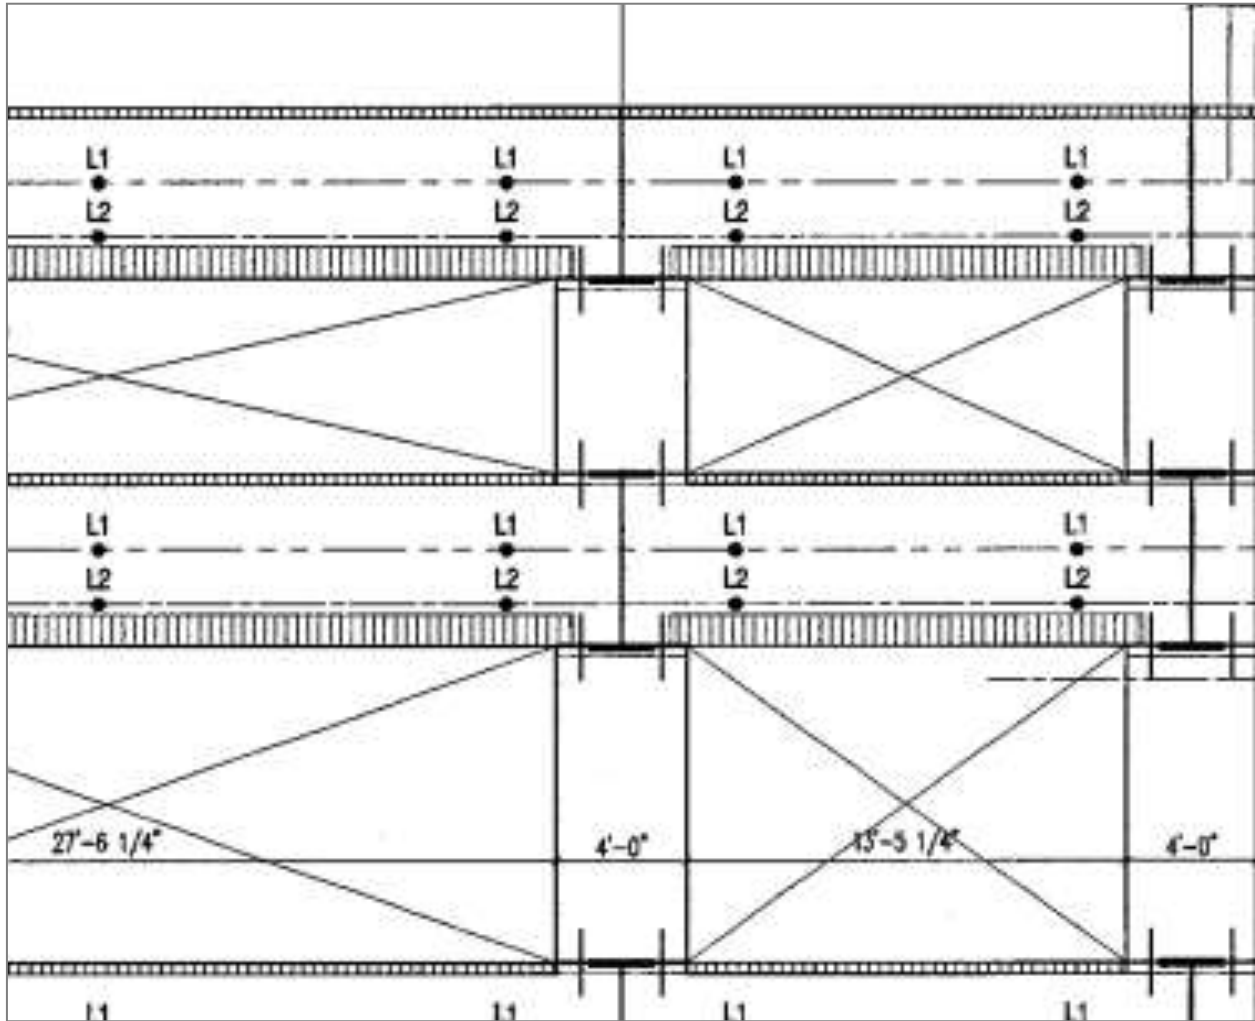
Building Drawing with Rocking Panel between Floors (from KPFF- Consulting Engineers)
